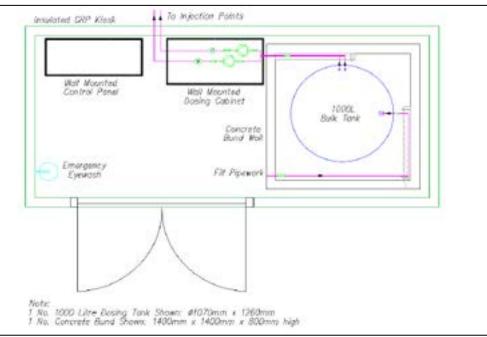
IW Schematic of a bulk tank kiosk layout in H3PO4 Installation with 500 litres< bulk storage ≤ 6,000 litres.
